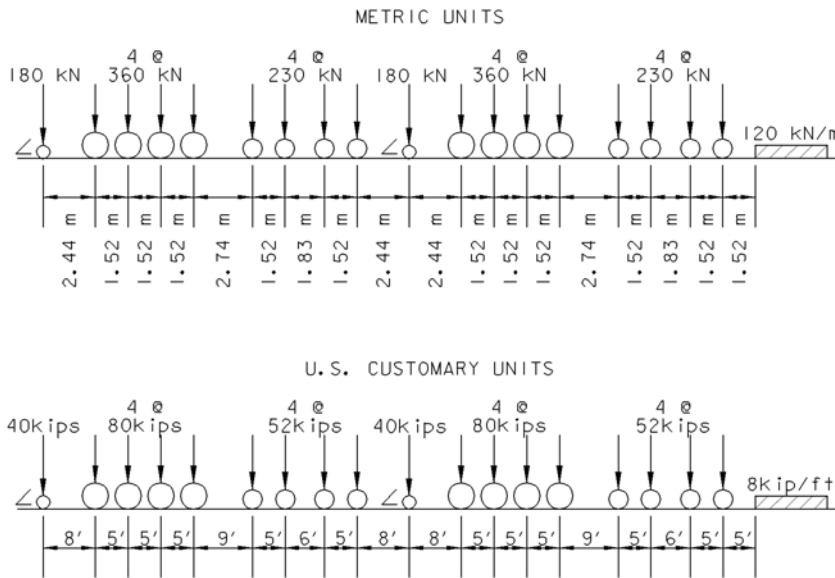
P-1 - Wheel Spacing for Cooper E80 Design Loading (Load/Axle)
